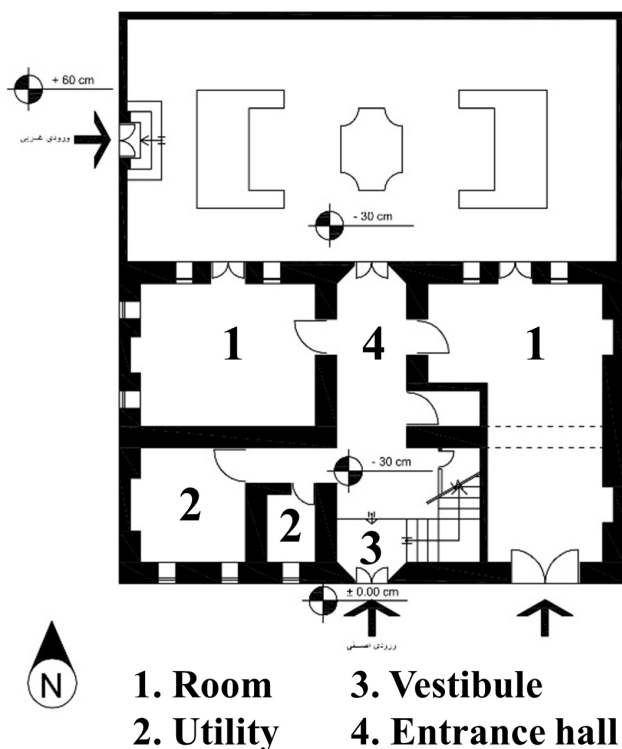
Ground floor plan (1/250) of house No. 1. Source: Authors.
